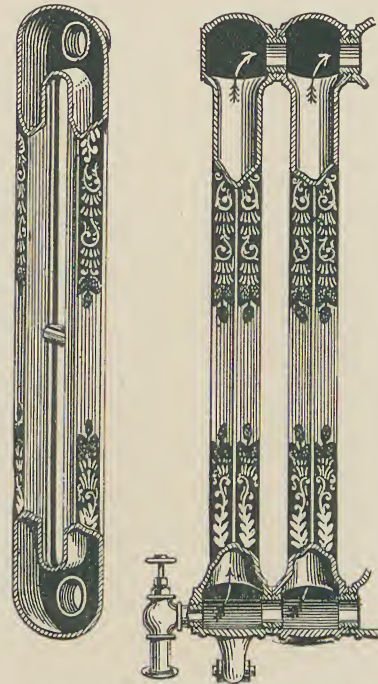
Section and View of parts of the "Safford" Radiator for Hot Water.
